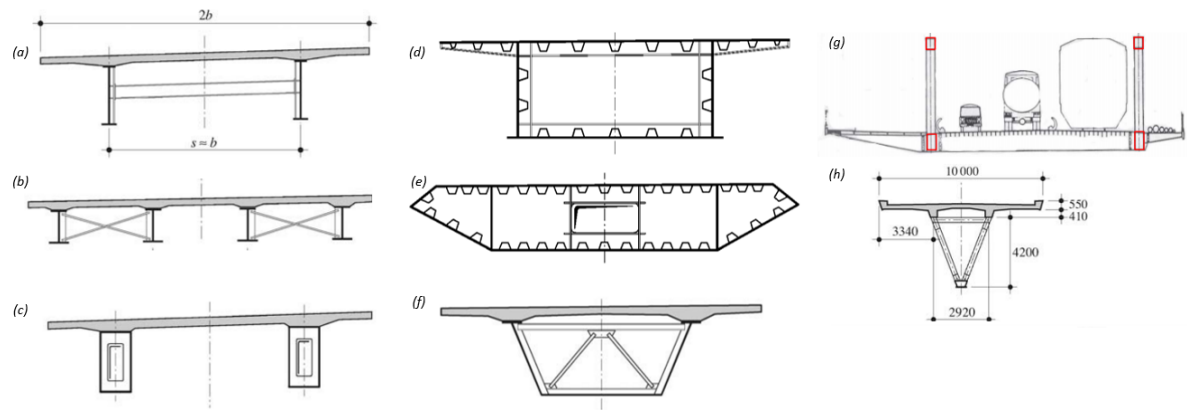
(a) twin girder bridge, (b) multi girder bridge, (c) twin box girder, (d) box girders, (e) multiple box girders, (f) U-shaped box girder, (g) twin planar trusses, (h) spatial trusses. (Pavlovic, 2018)
